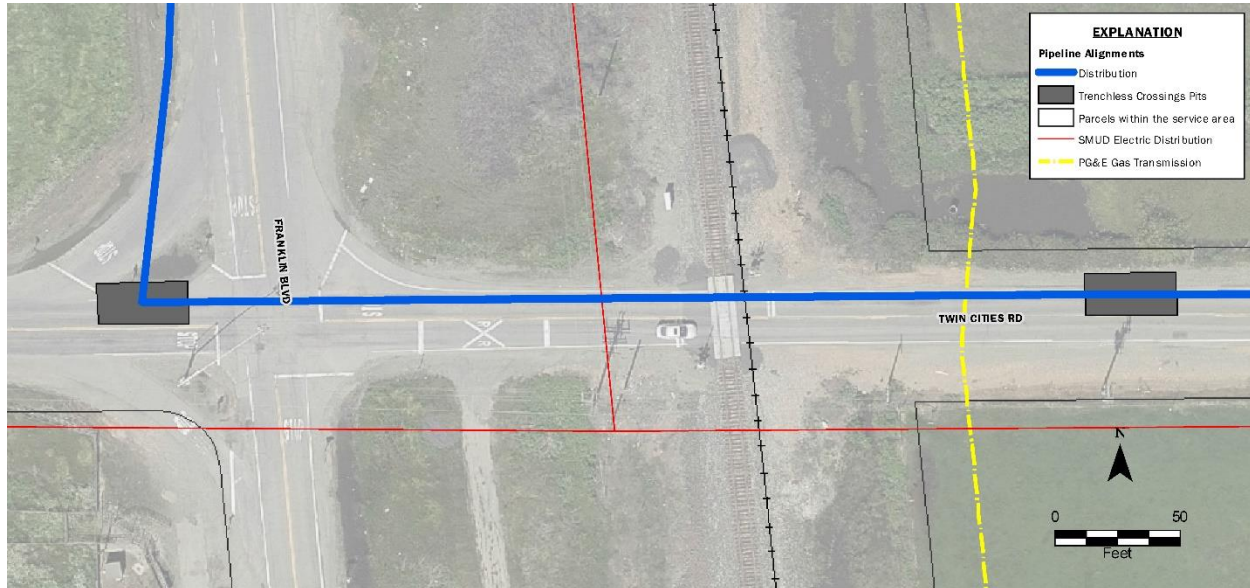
Proposed Trenchless Crossing of UPRR at Twin Cities Road
